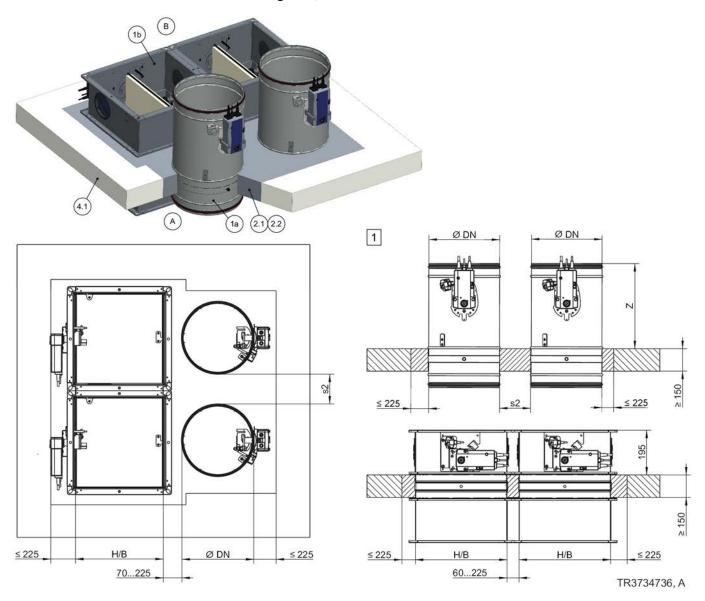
Mortar-based installation in solid ceiling slab, combined, FKR-EU and FK2-EU, shown upright (also applicable for suspended arrangement)
